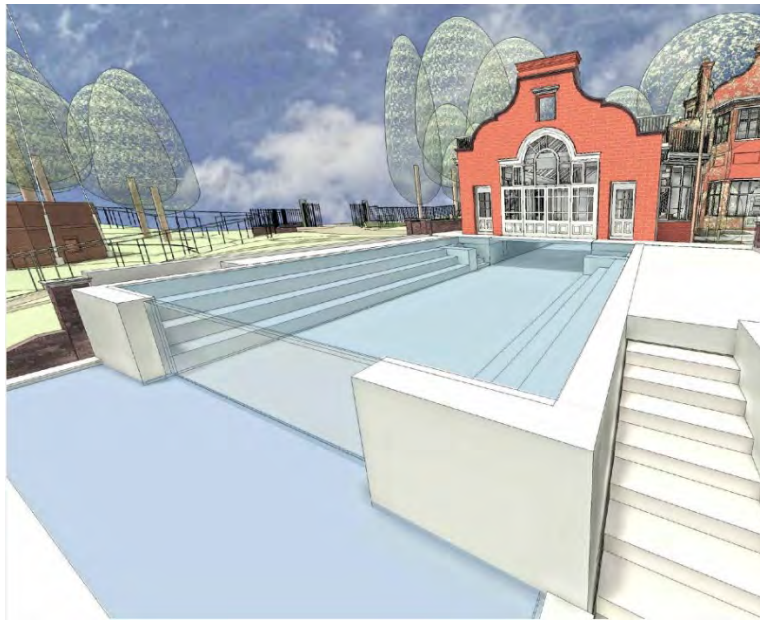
Proposed outdoors pool, early concept CGI. The end wall is solid in the final proposal
